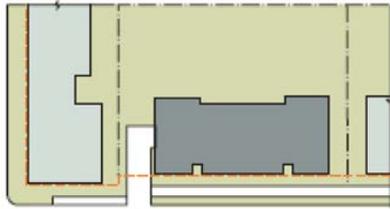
street setbacks consistent with the existing established building alignments.
